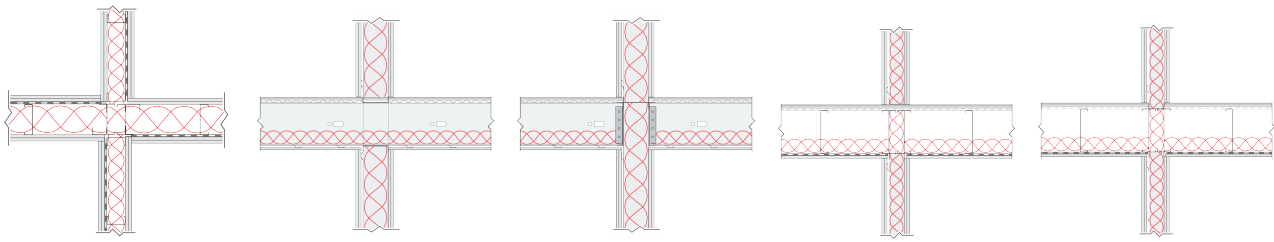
Details of the junctions tested in this study. From left to right: wall-wall junction (top view), floor-wall junction LbC (side view), floor-wall junction LbD (side view), floor-wall junction NLbC (side view), floor-wall junction NLbD (side view).
